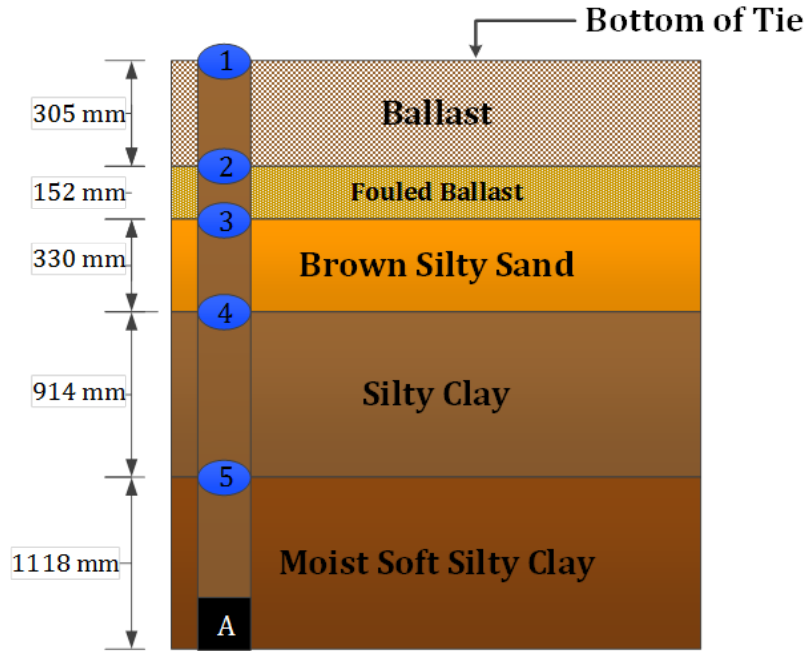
Substructure Layer Profile for Caldwell Street 80 ft From the South Abutment (Track 3; West End of Tie)
